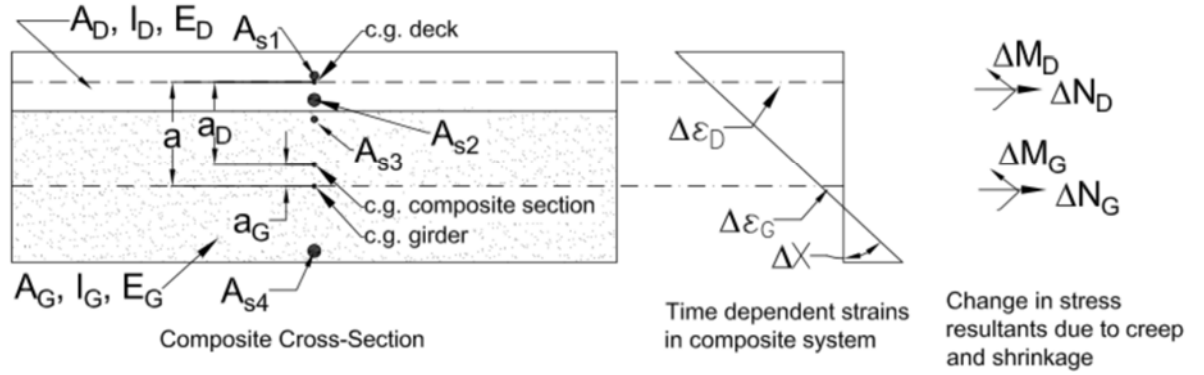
Forces in the Cross Section Due to Differential Shrinkage and Creep. (Menkulasi F., 2014)
